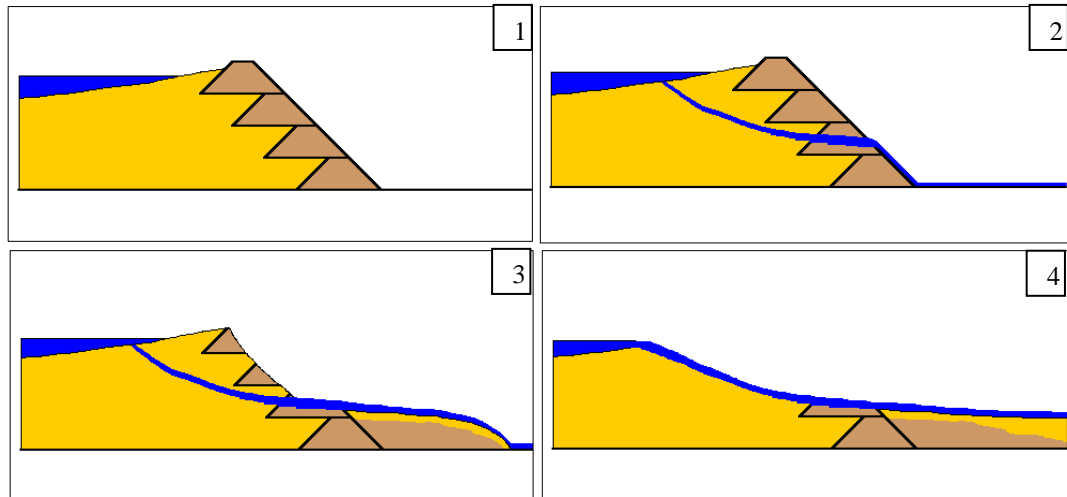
Stages of piping; 1) stable state, 2) and 3) piping through the dam body, 4) dam failure (www.wise-uranium.org, 2008)
